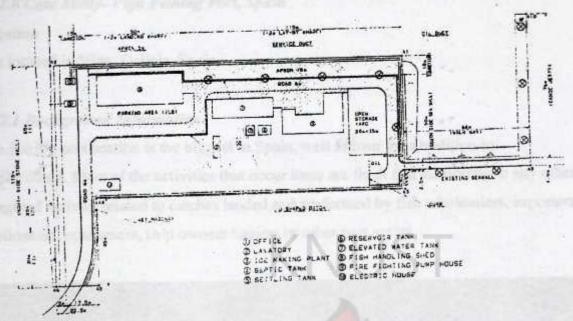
Layout plan, Bosomtwi Sam Fishing Habor (not to scale)
